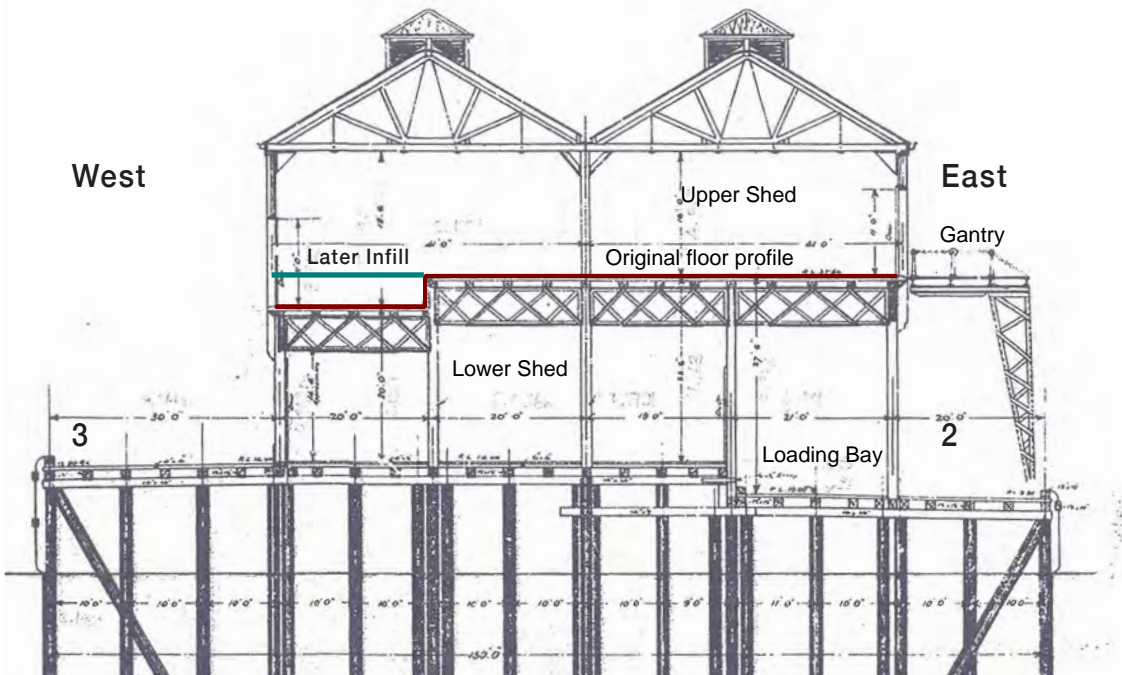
Original section showing floor profile with lowered floor to the west and loading bay to the east Pier 2/3
